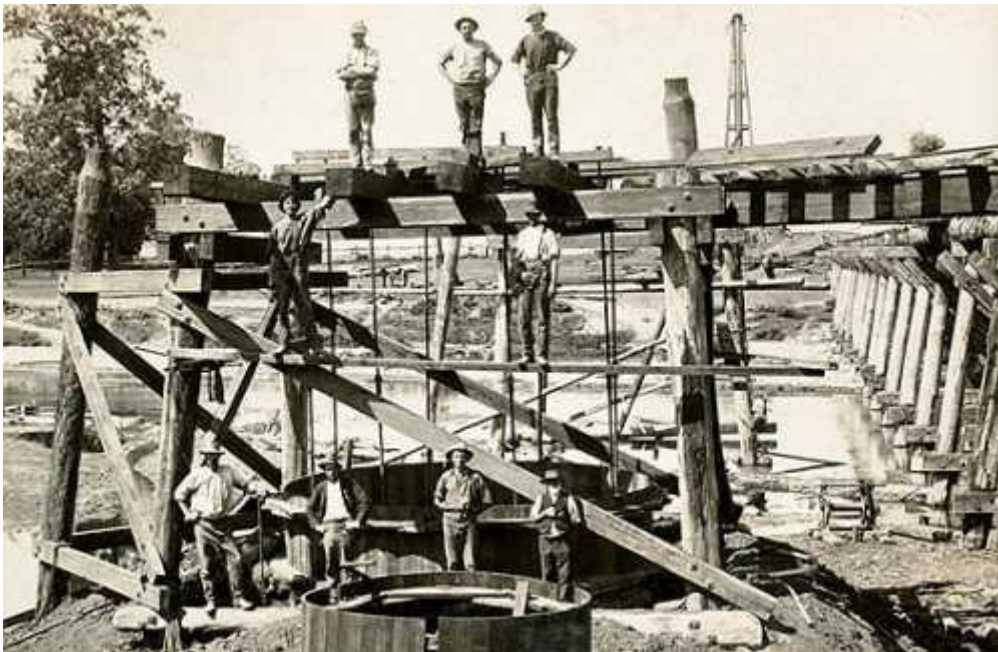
Workers constructing Pier 3. Image: source unknown.
